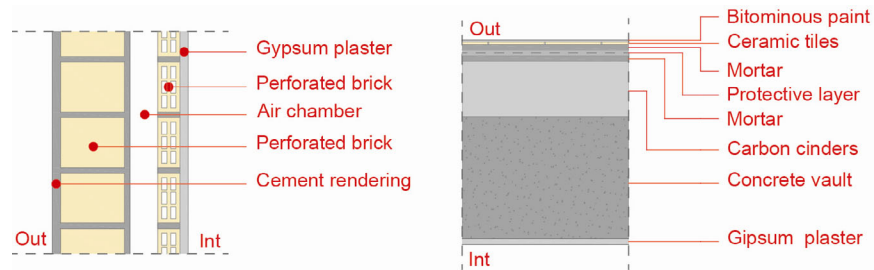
Layout of: (left) courtyard walls; (right) surrounding roofs
